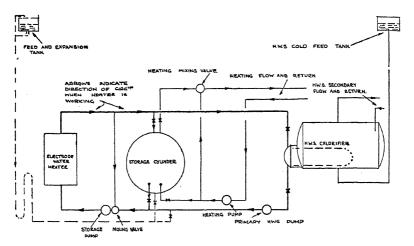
Diagram of Connection of Hot-Water System from Thermal Storage Plant.
